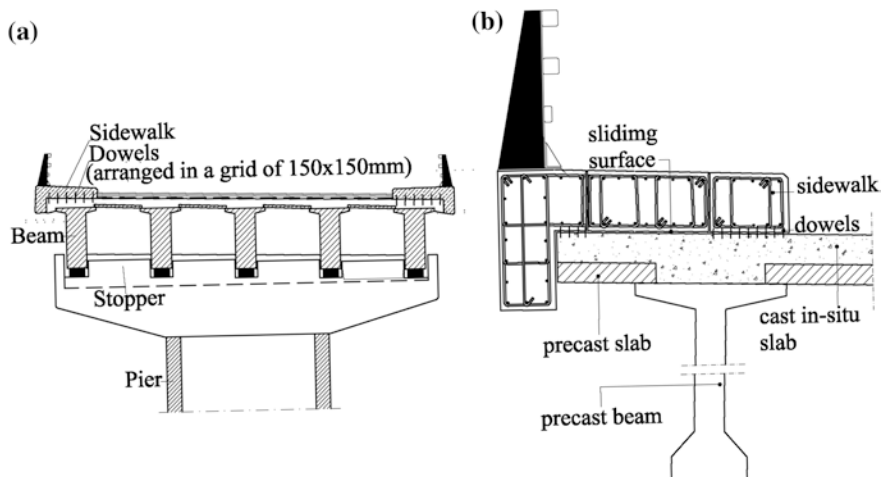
a Cross-section of the sidewalk-restrainers at the anchorage length (Section A-A in Fig. 2), b cross-section of the sidewalks-restrainers (section B-B in Fig. 2)
